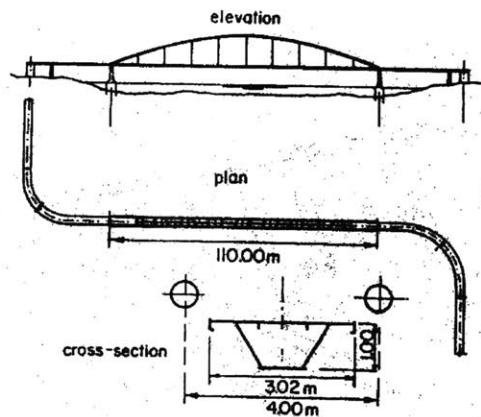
Footbridge with Lateral Vibrations at 1.1 Hz: Elevation, Plan, and Cross Section
